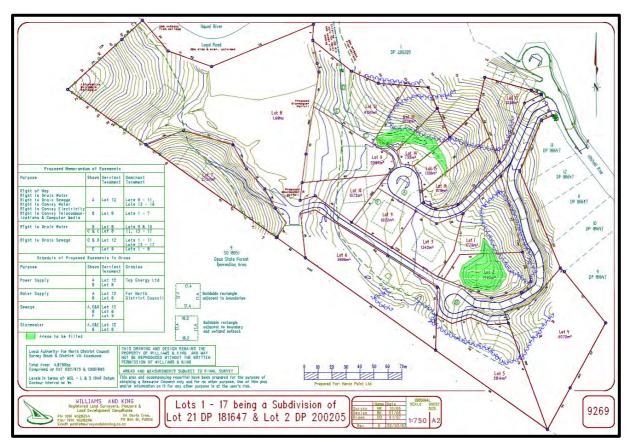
Previously approved scheme plan for 17 lots (RC2061183)
